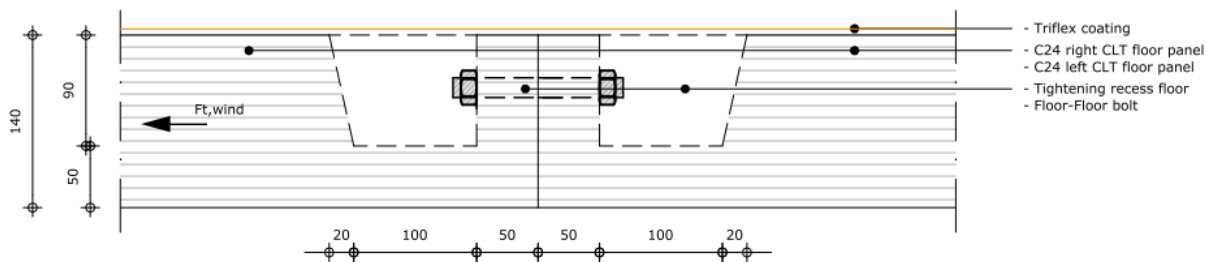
Cross-section A-A of Figure 10-7 floor-to-floor connection with tension wind force in mm
